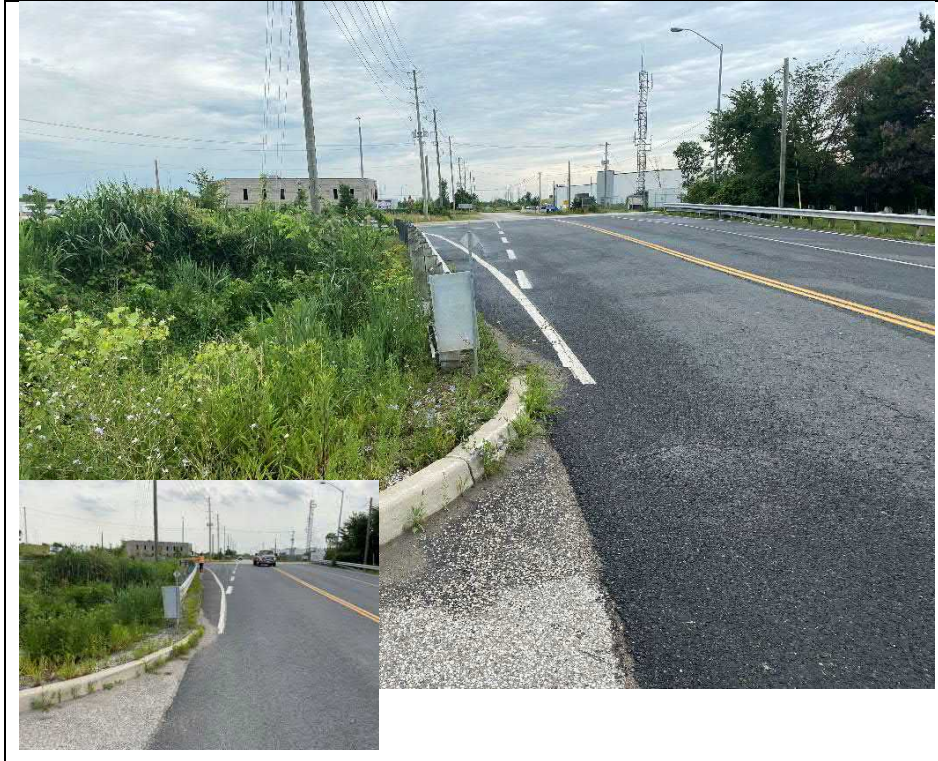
Pavement joint between the deck and approach wearing surfaces (Looking Northeast)
